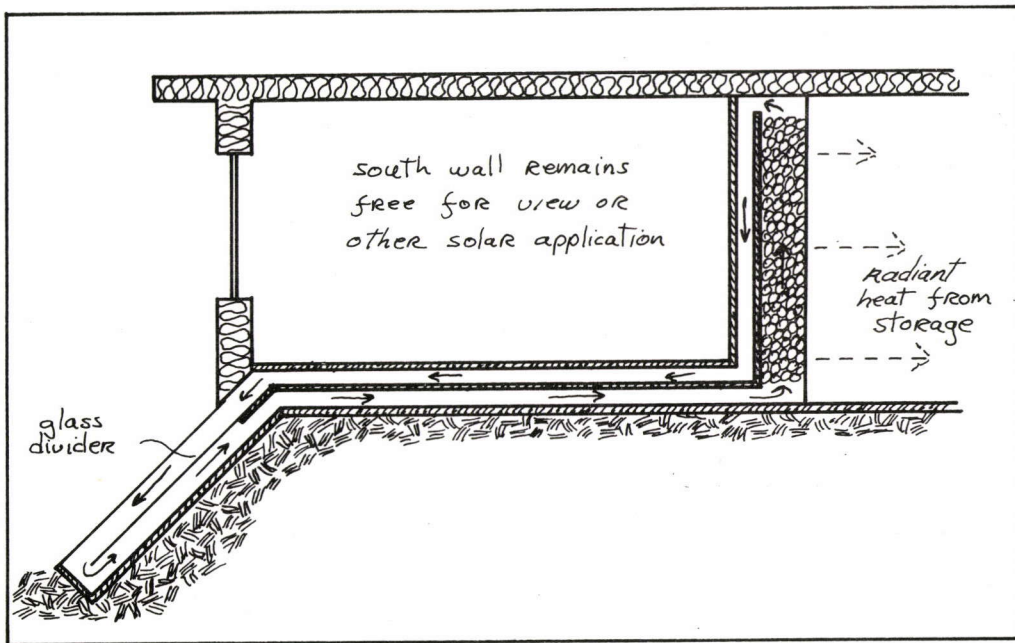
Center-glazed U-tube collector with upflow storage. Designed to provide radiant wall heat to north room.
